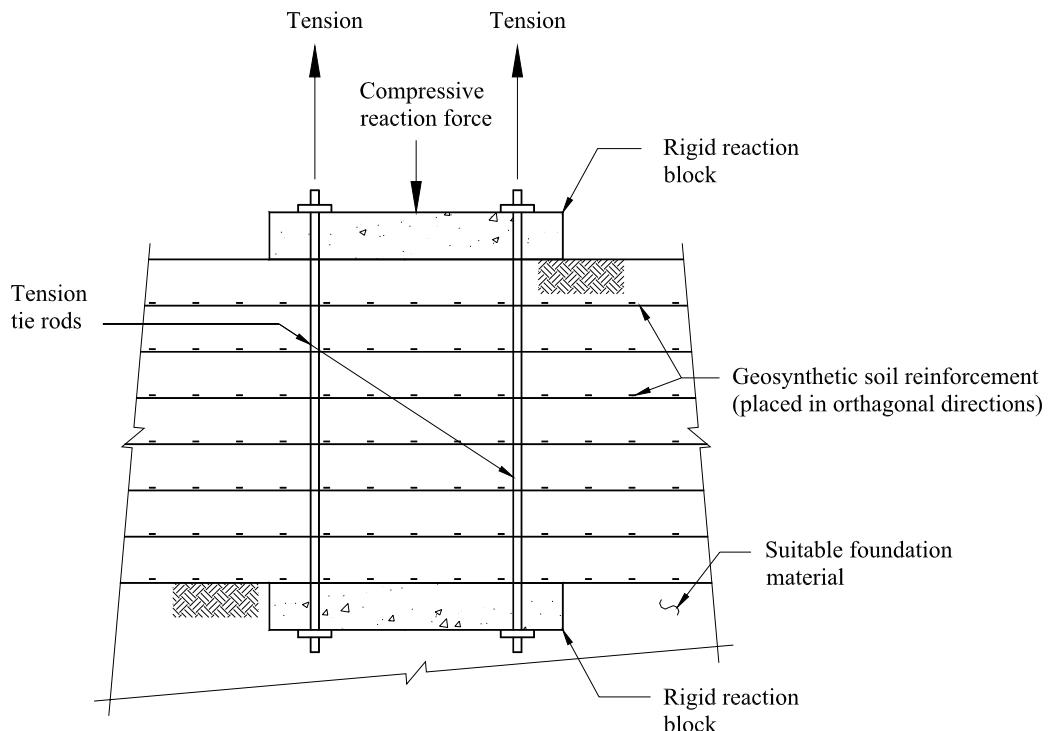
A preloaded and prestressed GRS structure [adapted from Uchimura et al., 1998].
